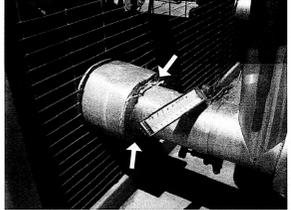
ASBESTOS-CONTAINING MUDDED JOINT PACKING LOCATED ON CHILLER PIPING ENDS TO BE REMOVED
